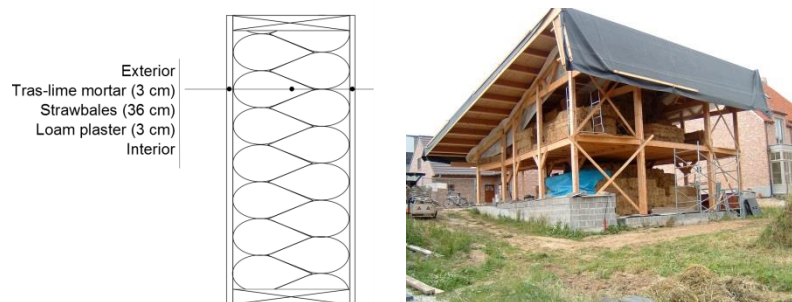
left) Straw bale wall and right) construction of straw bale house.
